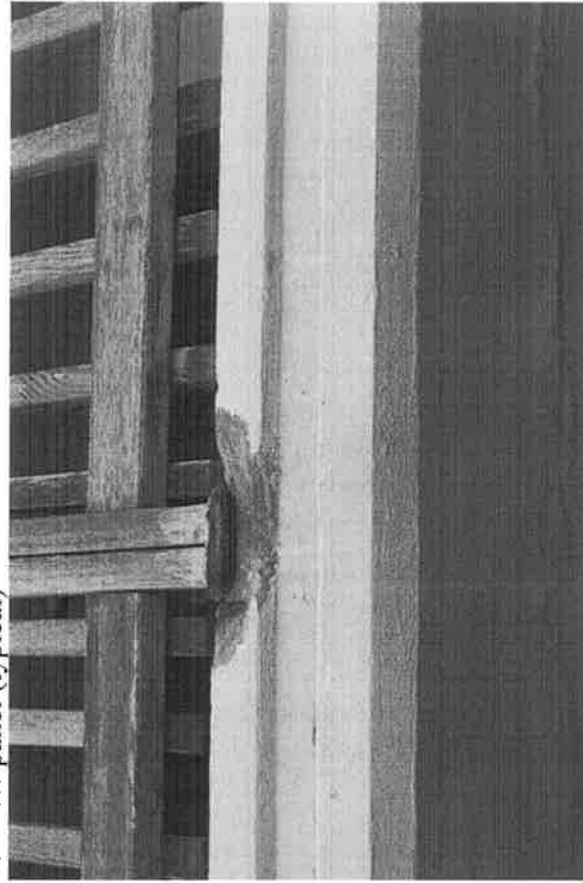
Isolated corrosion in hollow core concrete panel (typical)
